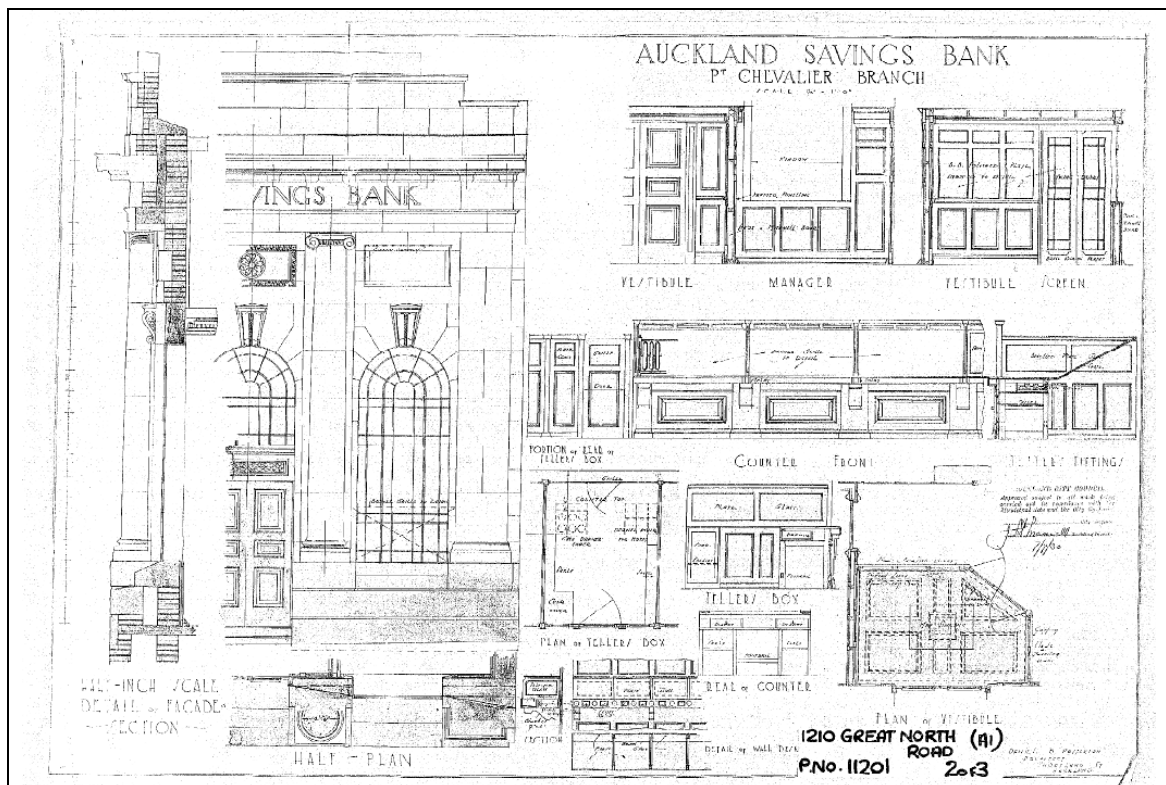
Auckland Savings Bank Point Chevalier Branch: North facade and banking chamber joinery details. Auckland Council Archives. Permit No. 11201
